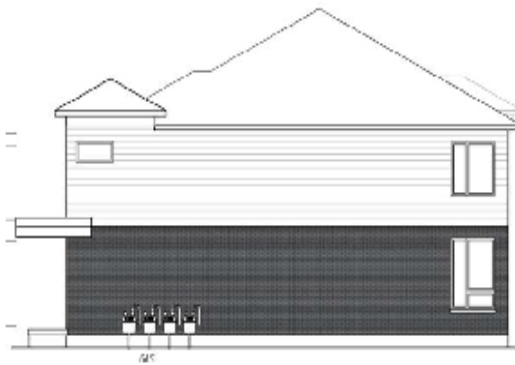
'c' Unit – Proposed south Elevations from Interior site
